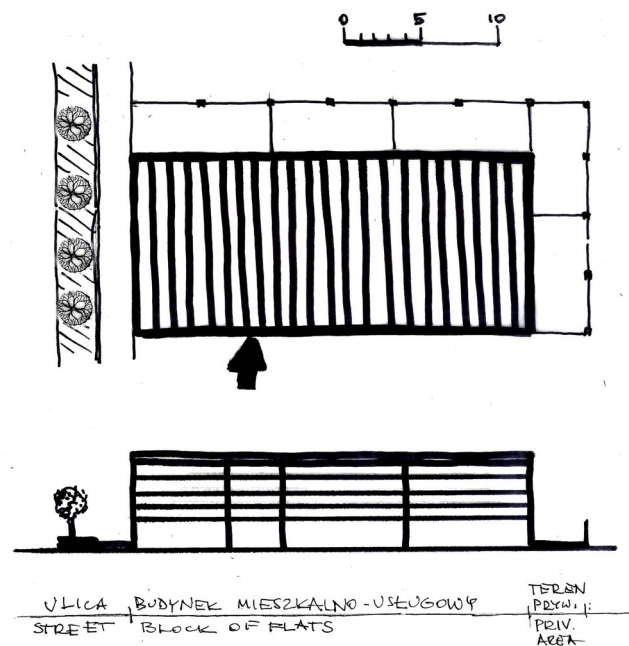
Layout of the grounds around a residential building erected after 2000 (plan and cross-section) (drawing I. Zalewska-Kantek)
